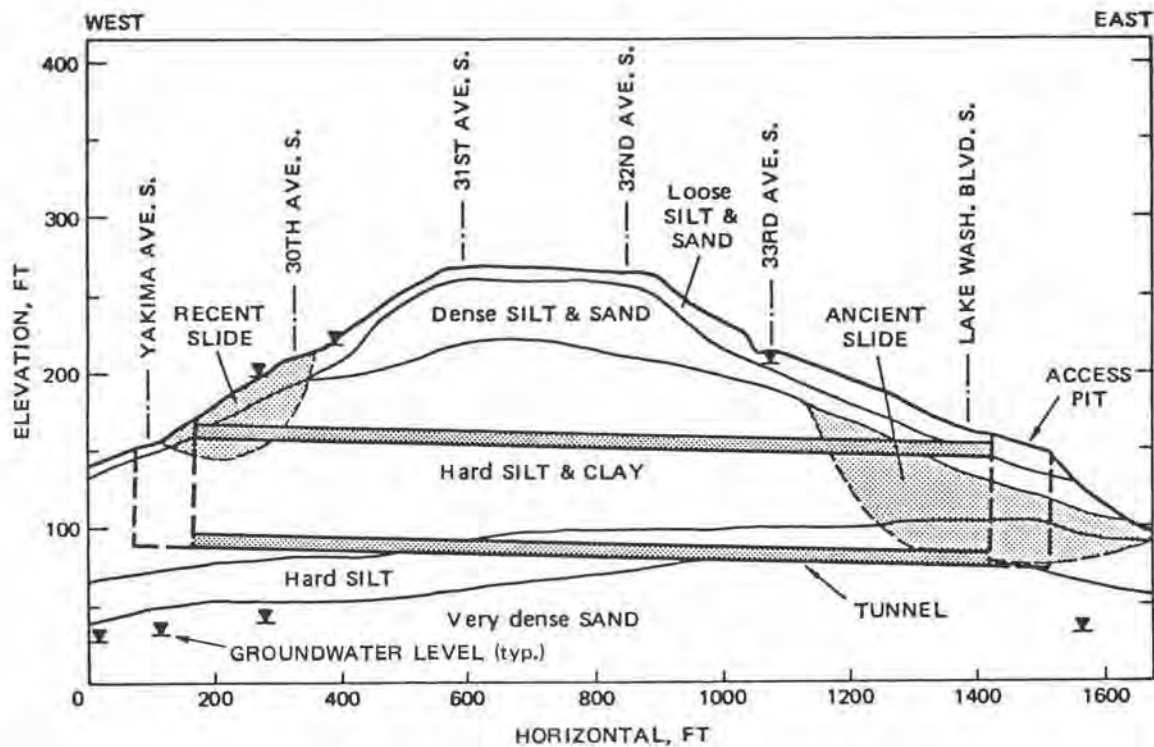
Longitudinal subsurface soil profile, Mt. Baker Ridge Tunnel.
